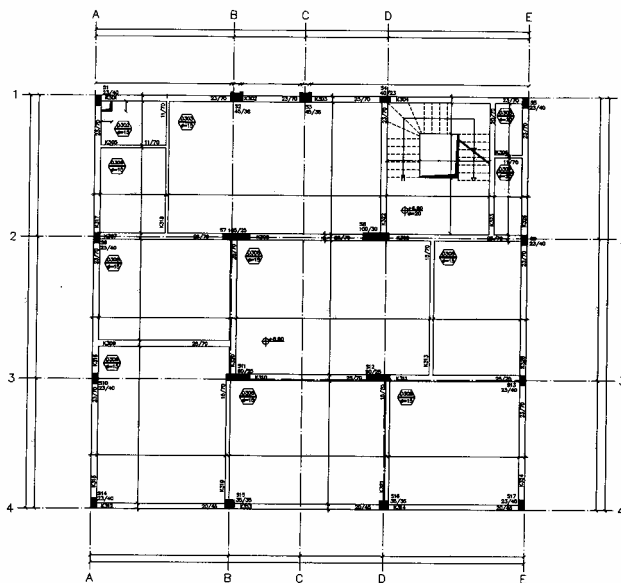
Structural Floor Plan for Stories 2, 3 and 4
